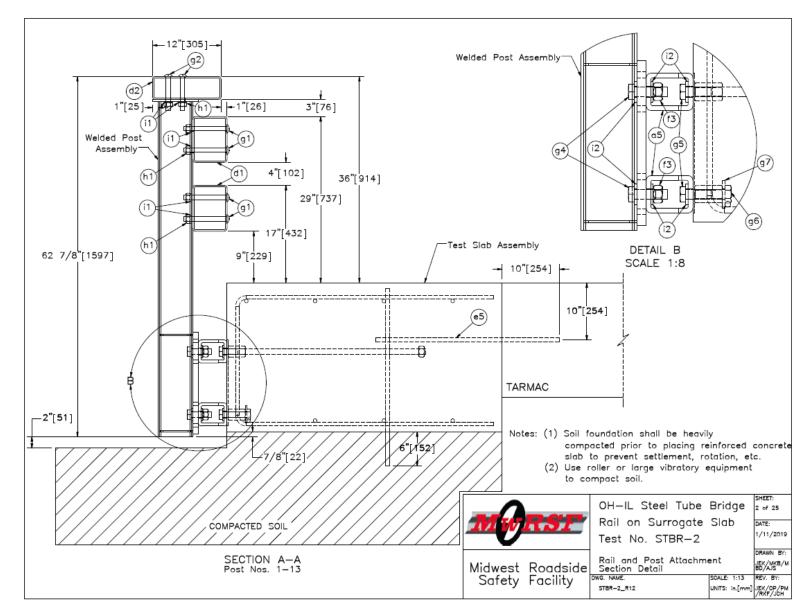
Rail and Post Attachment Section Detail, Test No. STBR-2
